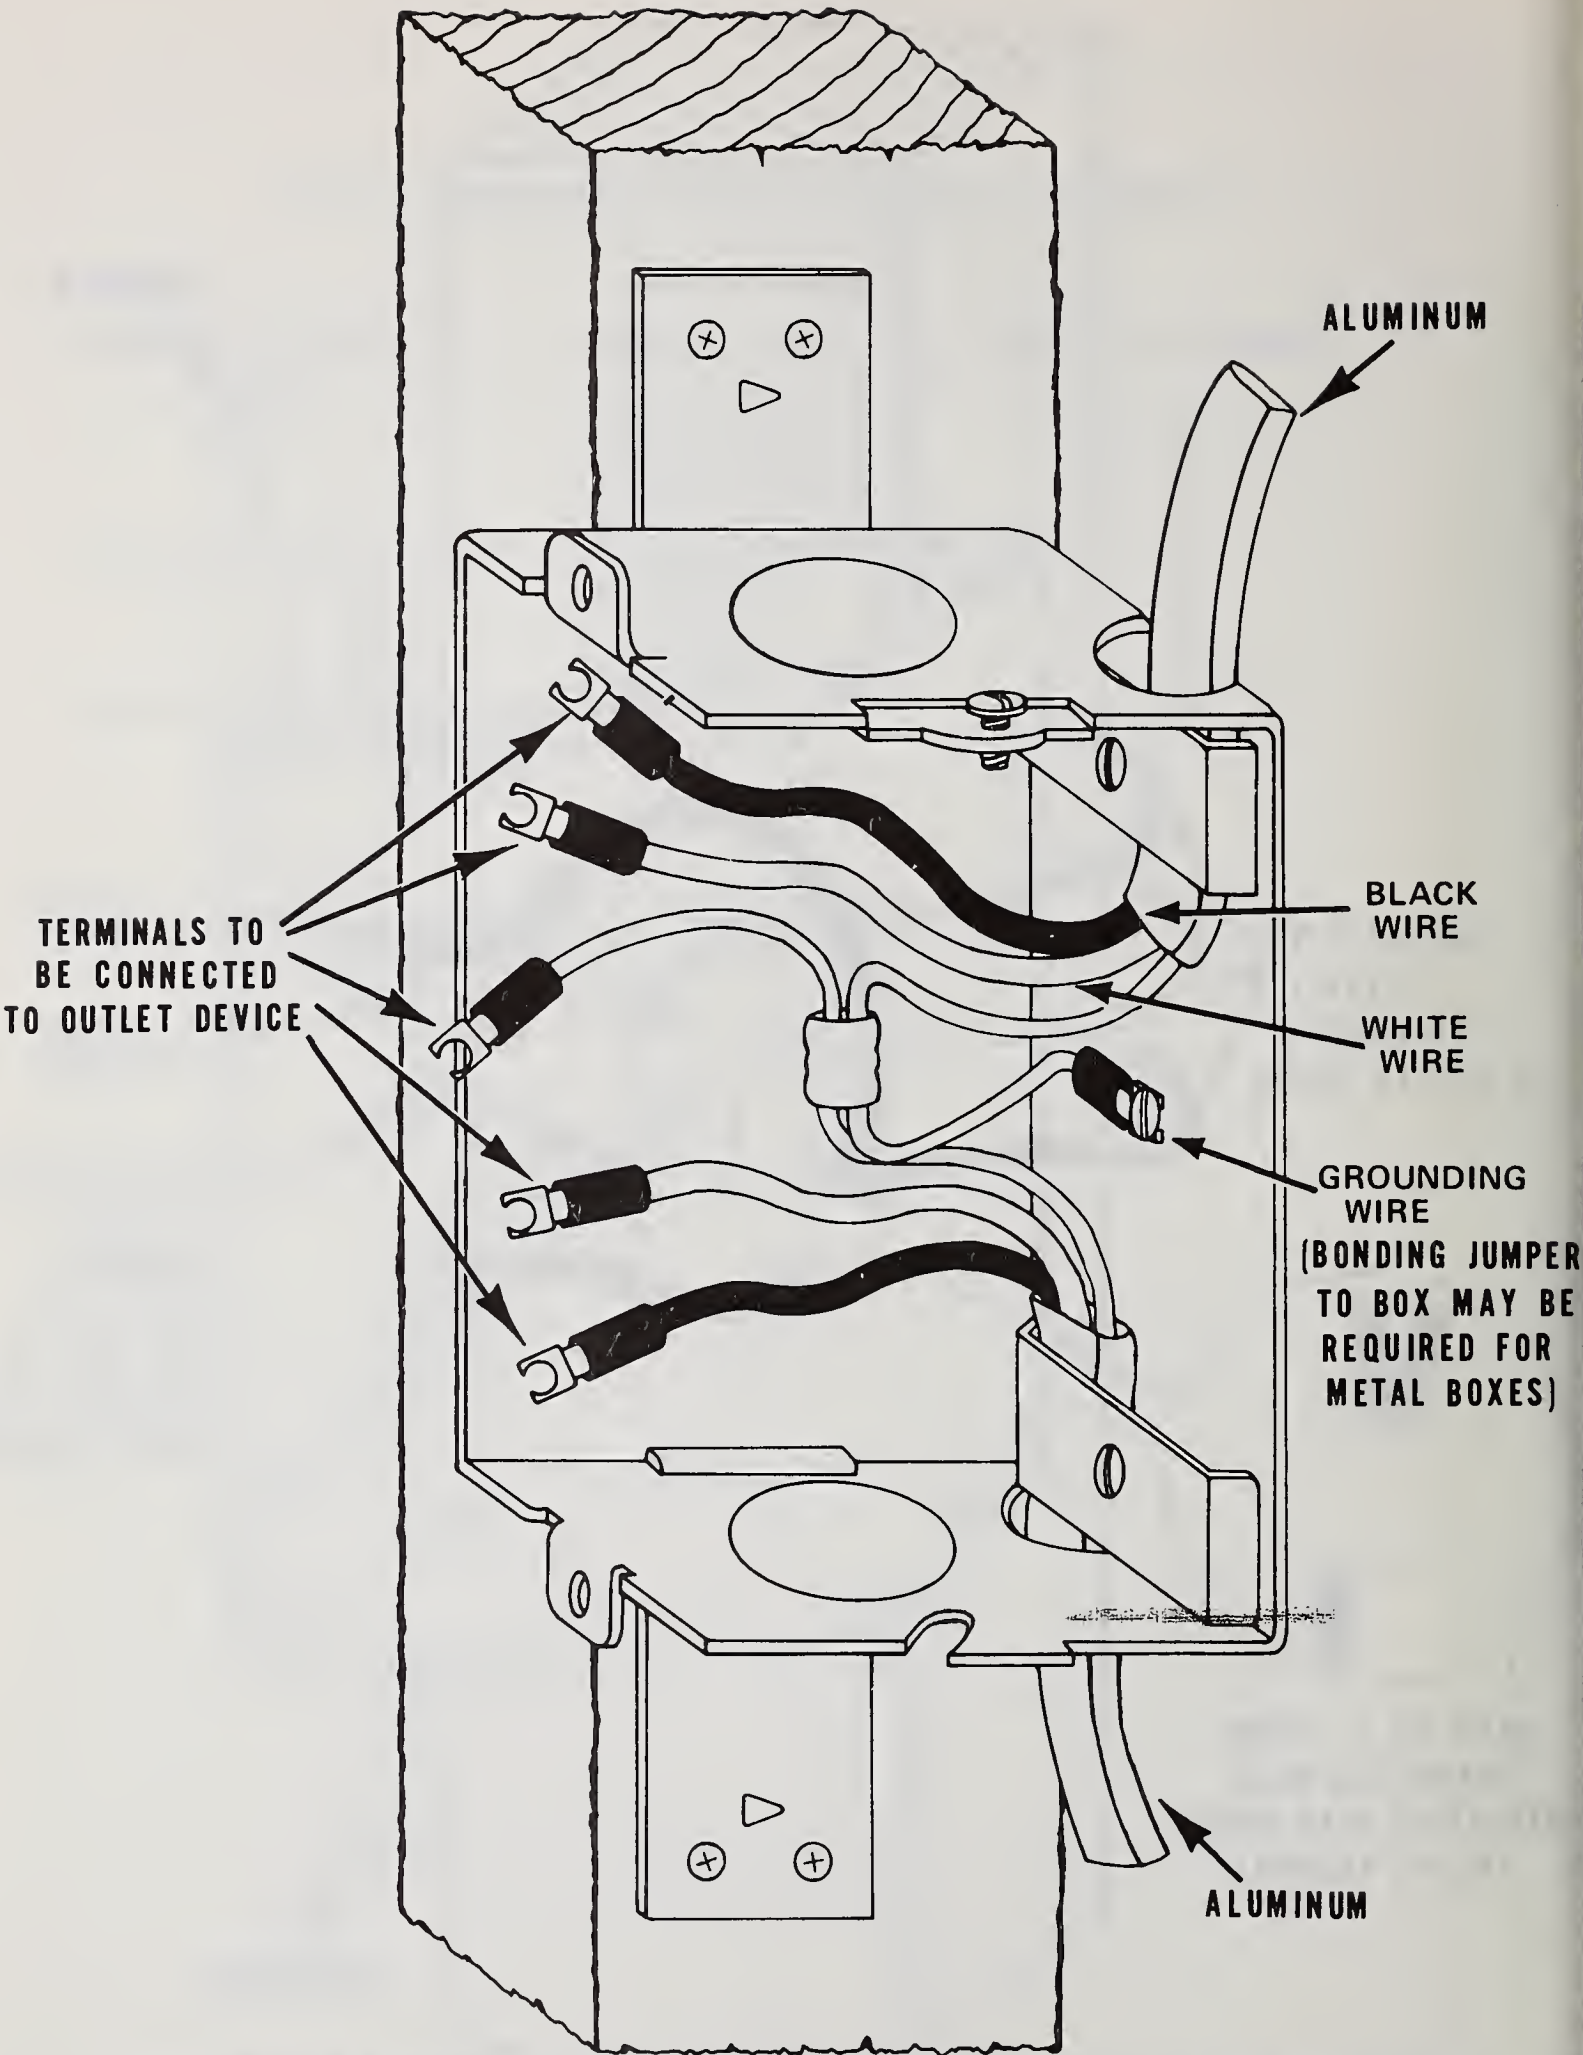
Terminals fastened to the ends of aluminum wire. The tongues of the terminals are fastened under the binding screws of a wiring device.
